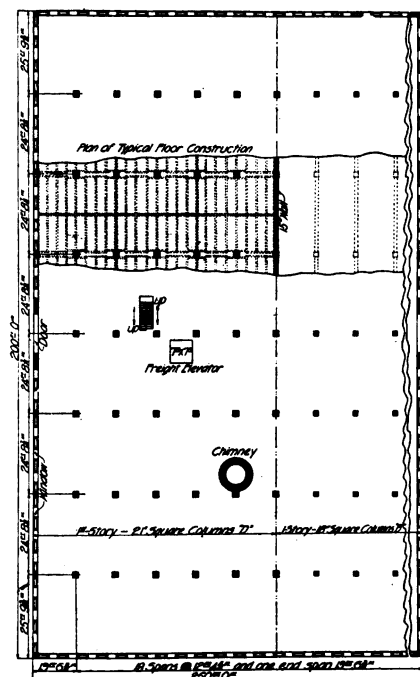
PLAN OF FIRST STORY OF PACIFIC COAST BORAX REFINERY.
